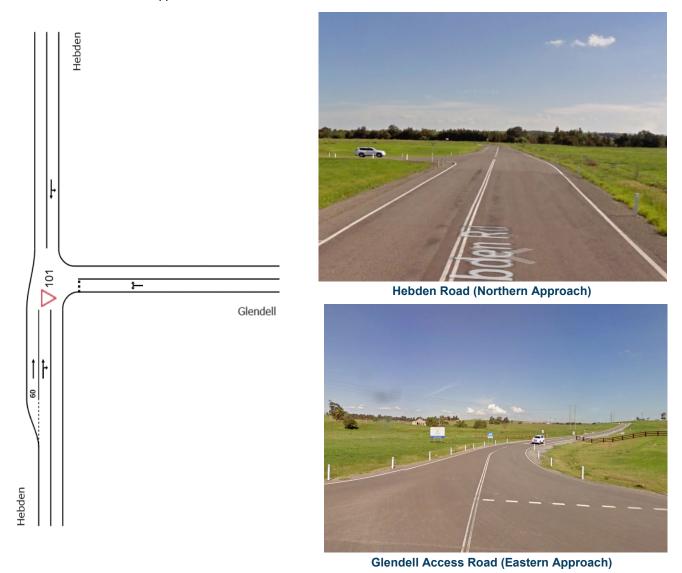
Hebden Road / Glendell Access Road Intersection Layout
